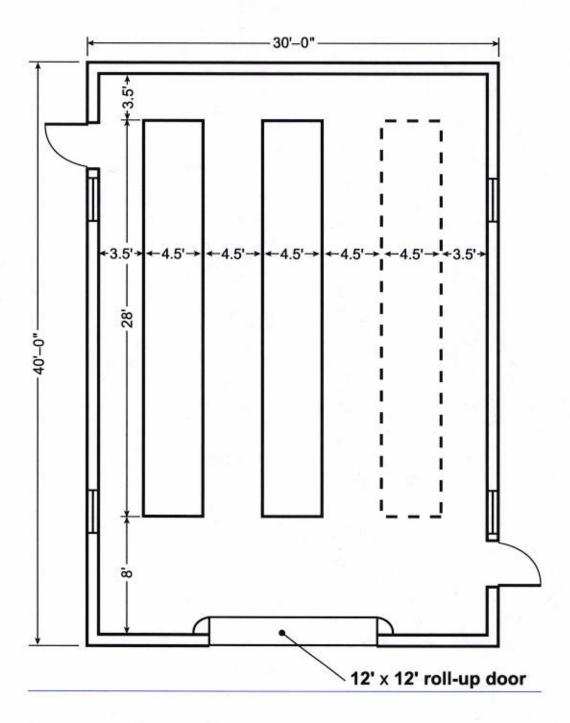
Magazine 816 Typical Container Storage Configuration
